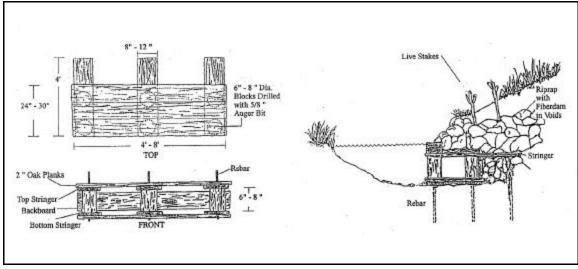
Construction of a lunker structure (Source: DuPage County Streambank Stabilization Program)
